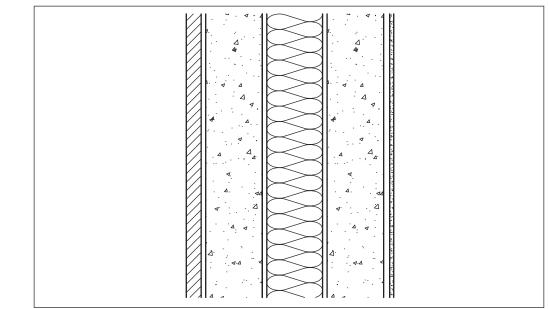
Masonry wall with cavity – Insulation filling the cavity
